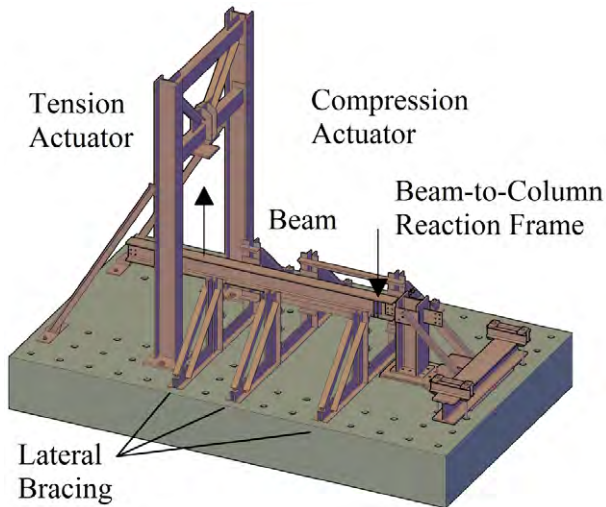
Schematic drawing of beam-to-column shear tab connection test setup
